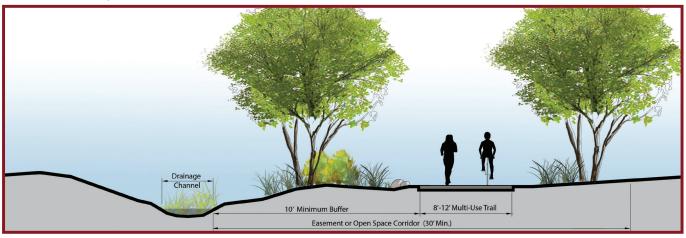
Typical Greenway or Drainage Channel Corridor Cross Section
